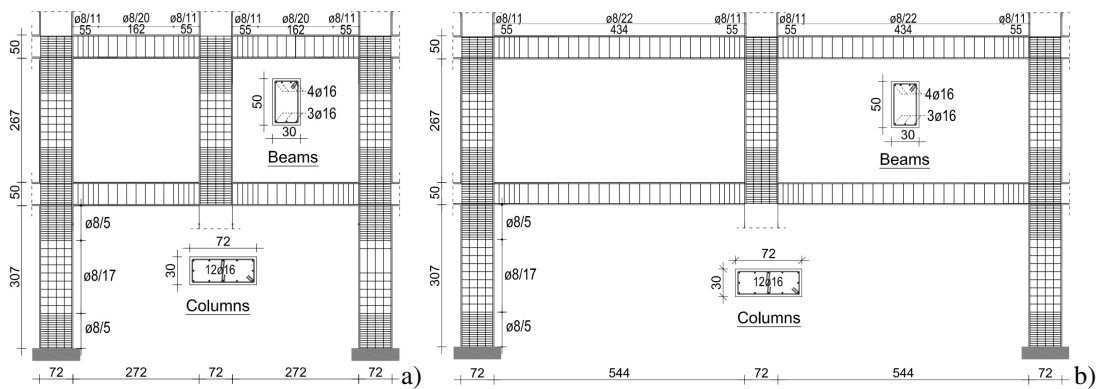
Sub-frames with seismic design extracted from: a) building A; b) building B.
